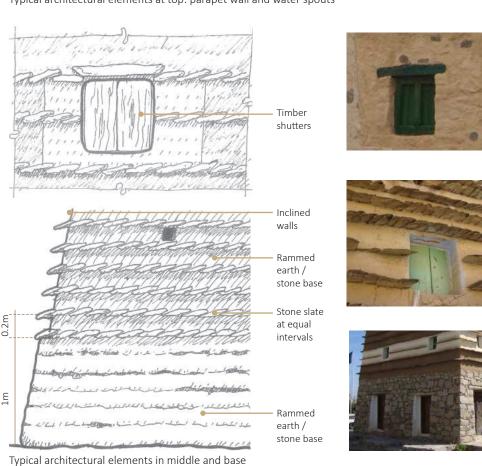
Traditional architectural elements & construction techniques in Sarwat mountains
